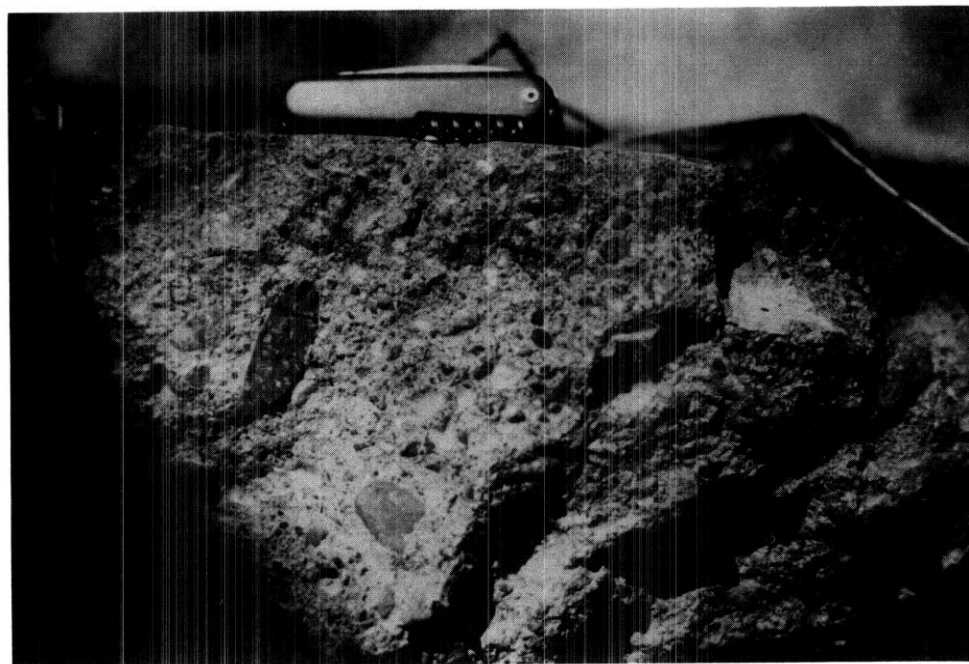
Close-up view of uncrushed pebbles, pit-run, used from gravel pit (Locality W-38) in construction of concrete out buildings of Fig.13.
